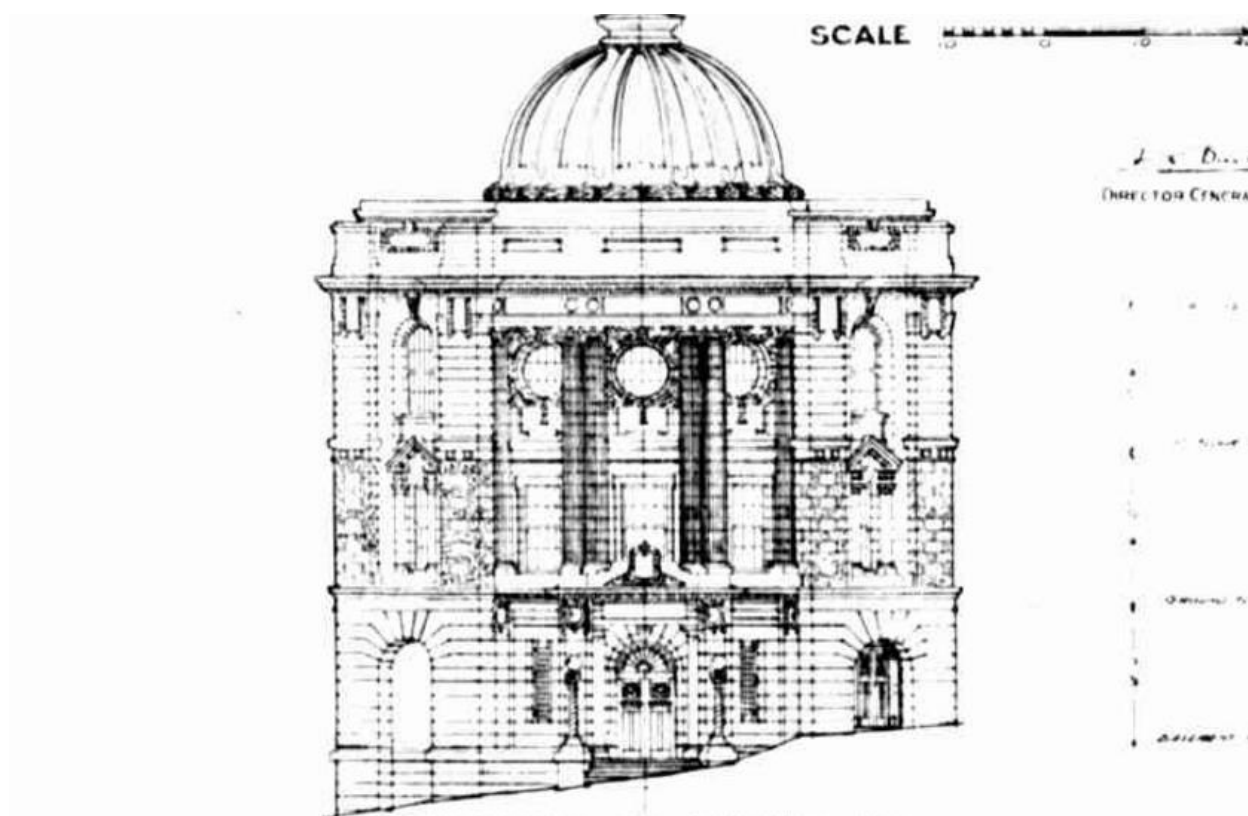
Additions to Treasury by George McRae in 1916 (Proposed elevation to corner of Bridge & Phillip St – not constructed)
